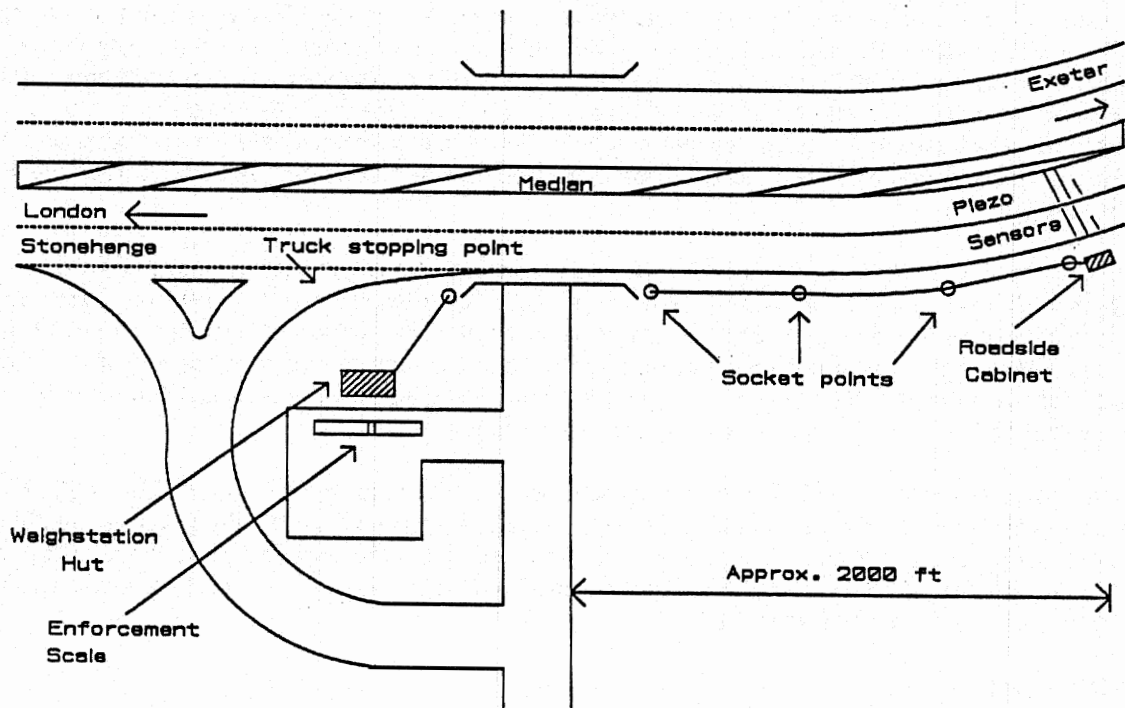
Site Plan of Wyllye WIM Sorter Installation
